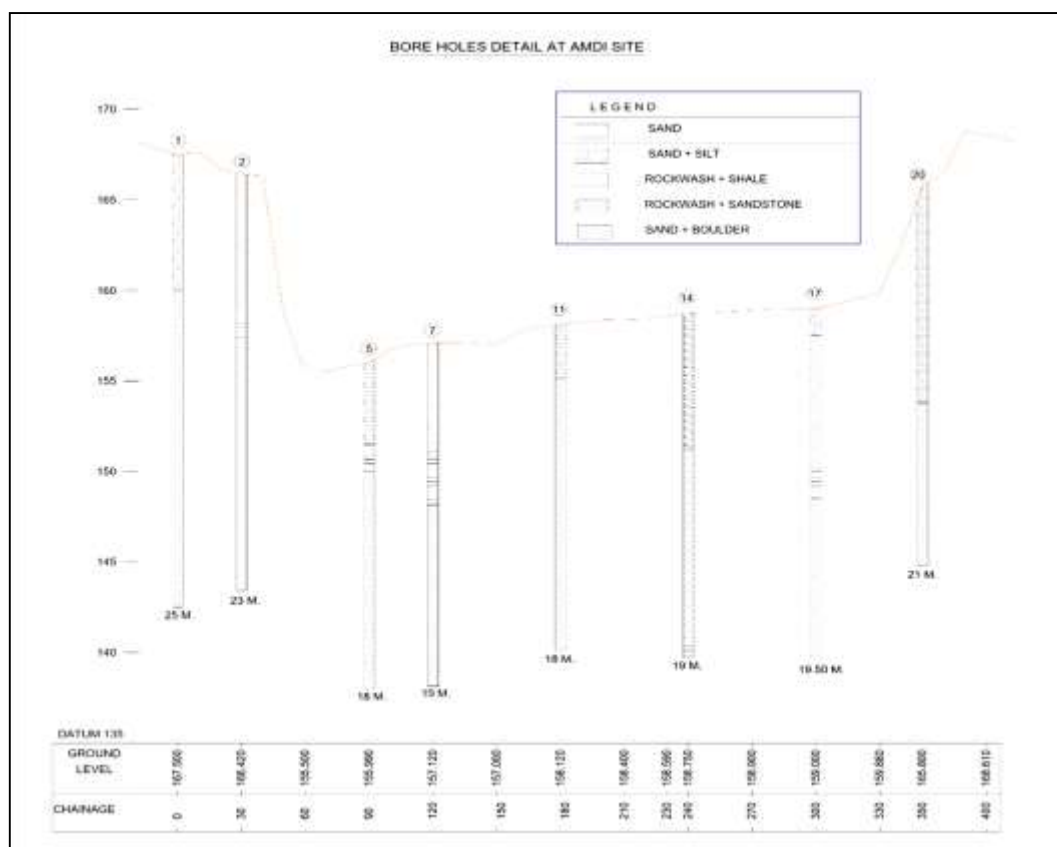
Details of Geotechnical investigation at proposed Pump house site
